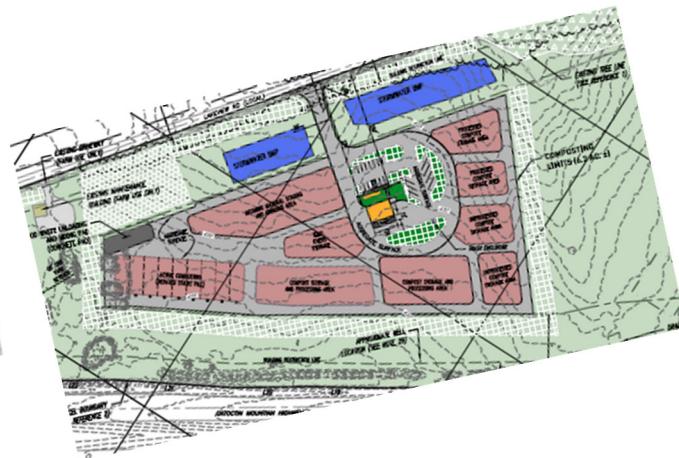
Excerpt from Attachment 5 (2025 Site Plan)
